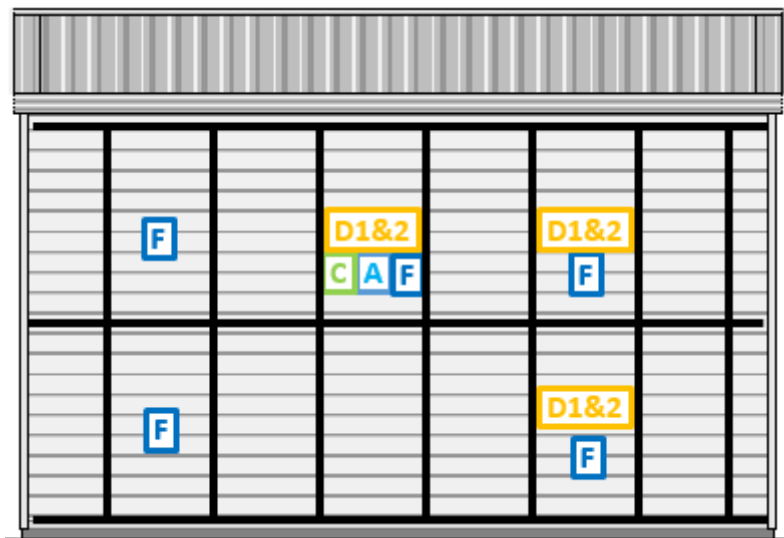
Experiment #1 general layout of devices in fire-rated wall (viewed from outside)
